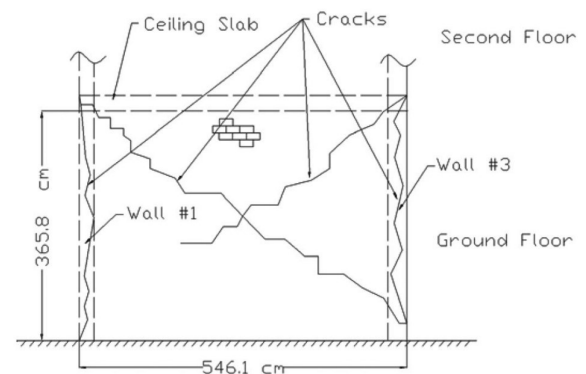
Pattern of cracks developed on the ground floor load bearing wall (Wall #2) (Zapata J. B. and Weggel C. D., 2008)
